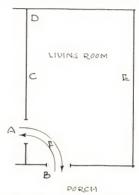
Recommended Location of Doors to Regulate Traffic Through Living Room
